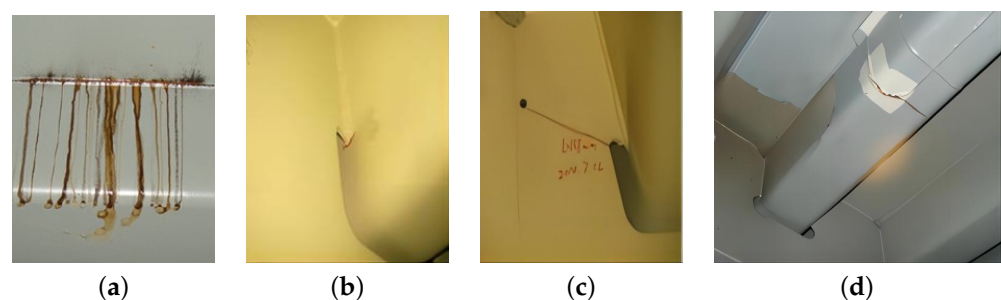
The typical locations of fatigue cracking: (a) Rib-to-deck crack; (b) Rib-to-floorbeam crack; (c) Cutout crack; (d) Rib splice crack.
